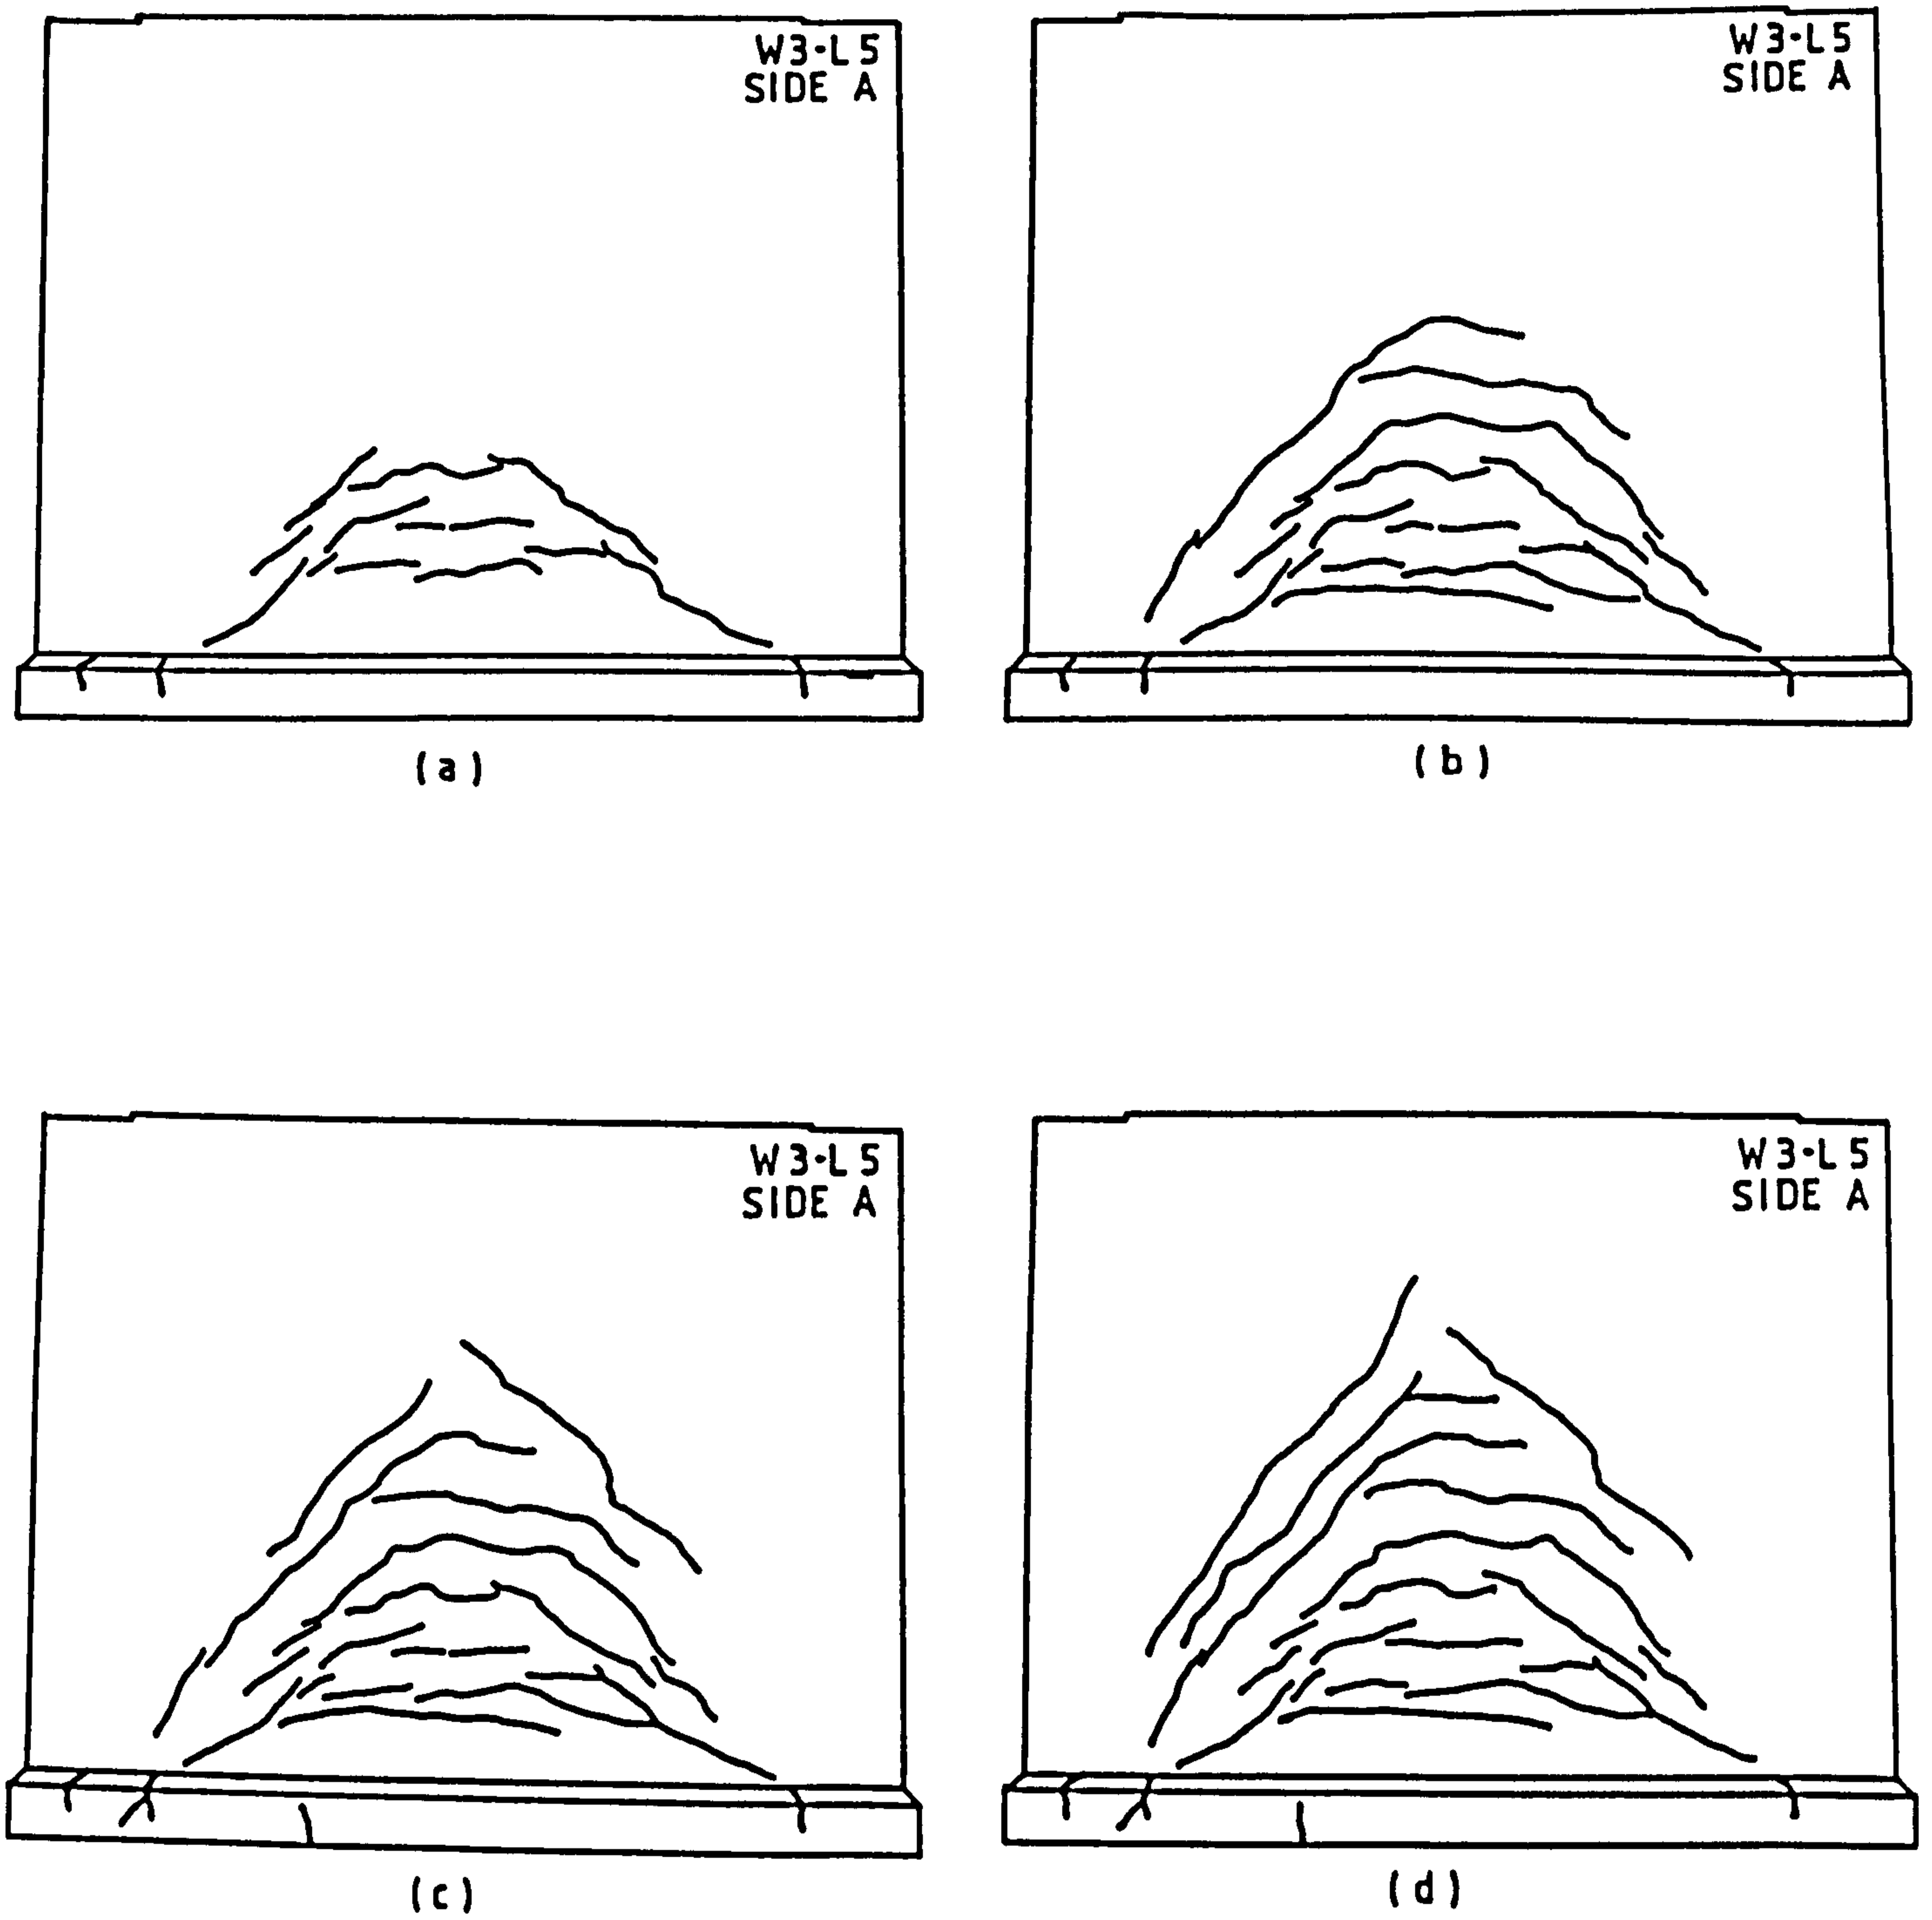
Development of cracks in wall W3-L5
